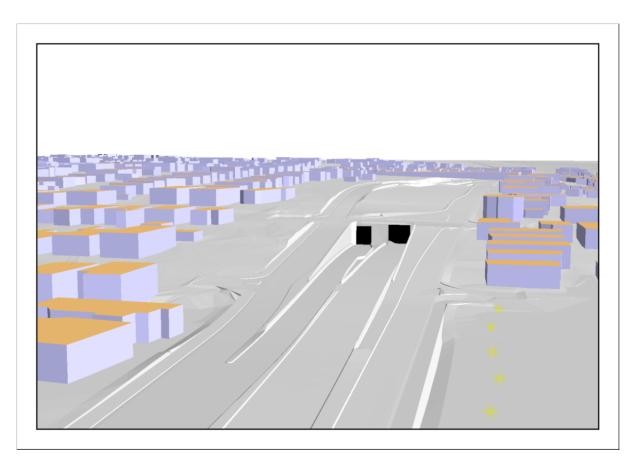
EIS Wattle Street interchange (oblique elevation, facing south)
